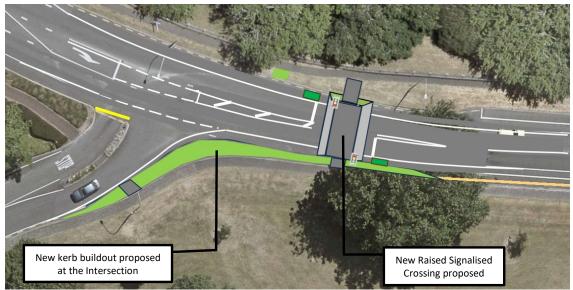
Preferred Option – Signalised Crossing on Raised Safety Platform.
